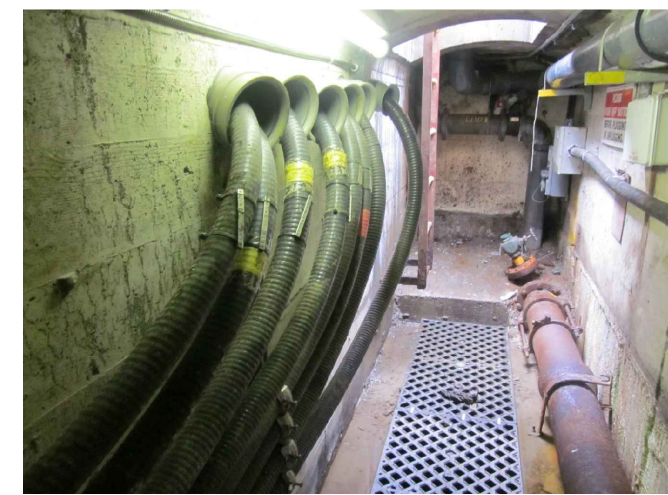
ELECTRICAL CABLING IN DOCK SERVICE TUNNEL (AT TUNNEL END, JUST EAST OF TIMBER CRIB)
